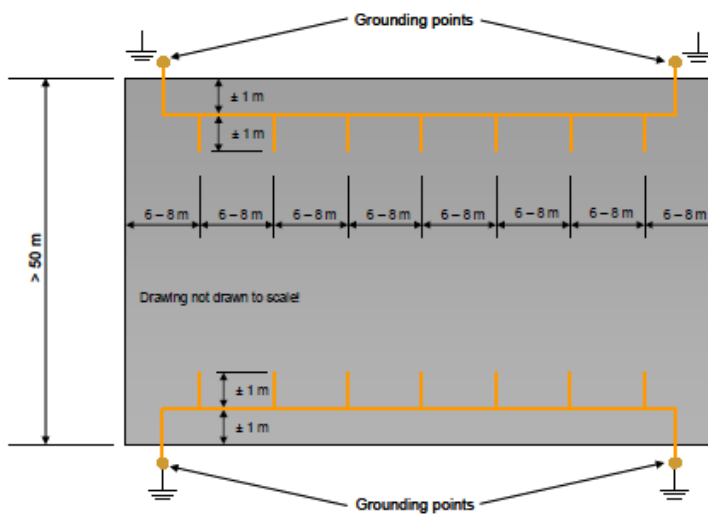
Copper strip layout for rooms > 50 m<sup>2</sup>, alternative B
